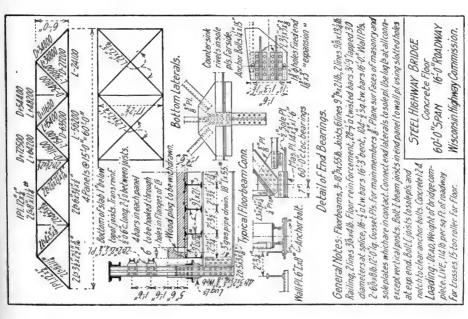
LOW TRUSS STEEL HIGHWAY BRIDGE.
